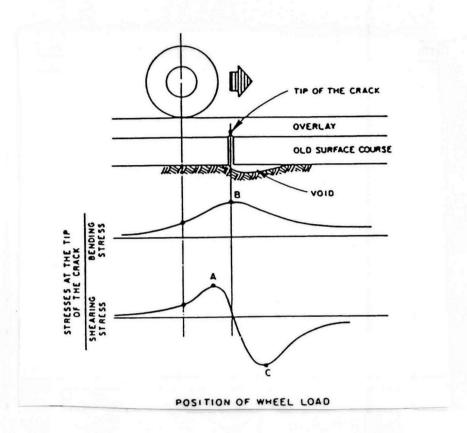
Stresses Induced at the Cracked Section Due to a Moving Wheel Load.
